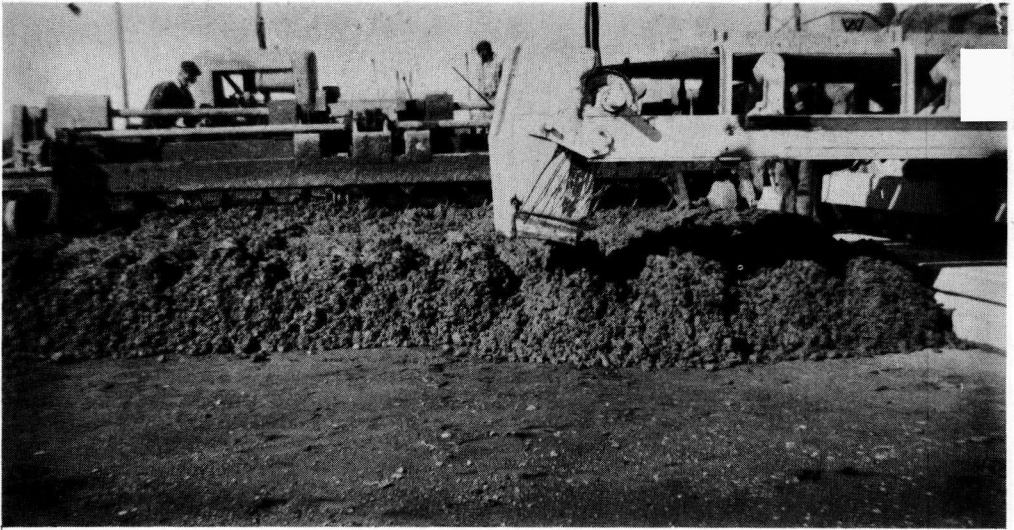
Spreading dry concrete, Plattsburg Air Base.
